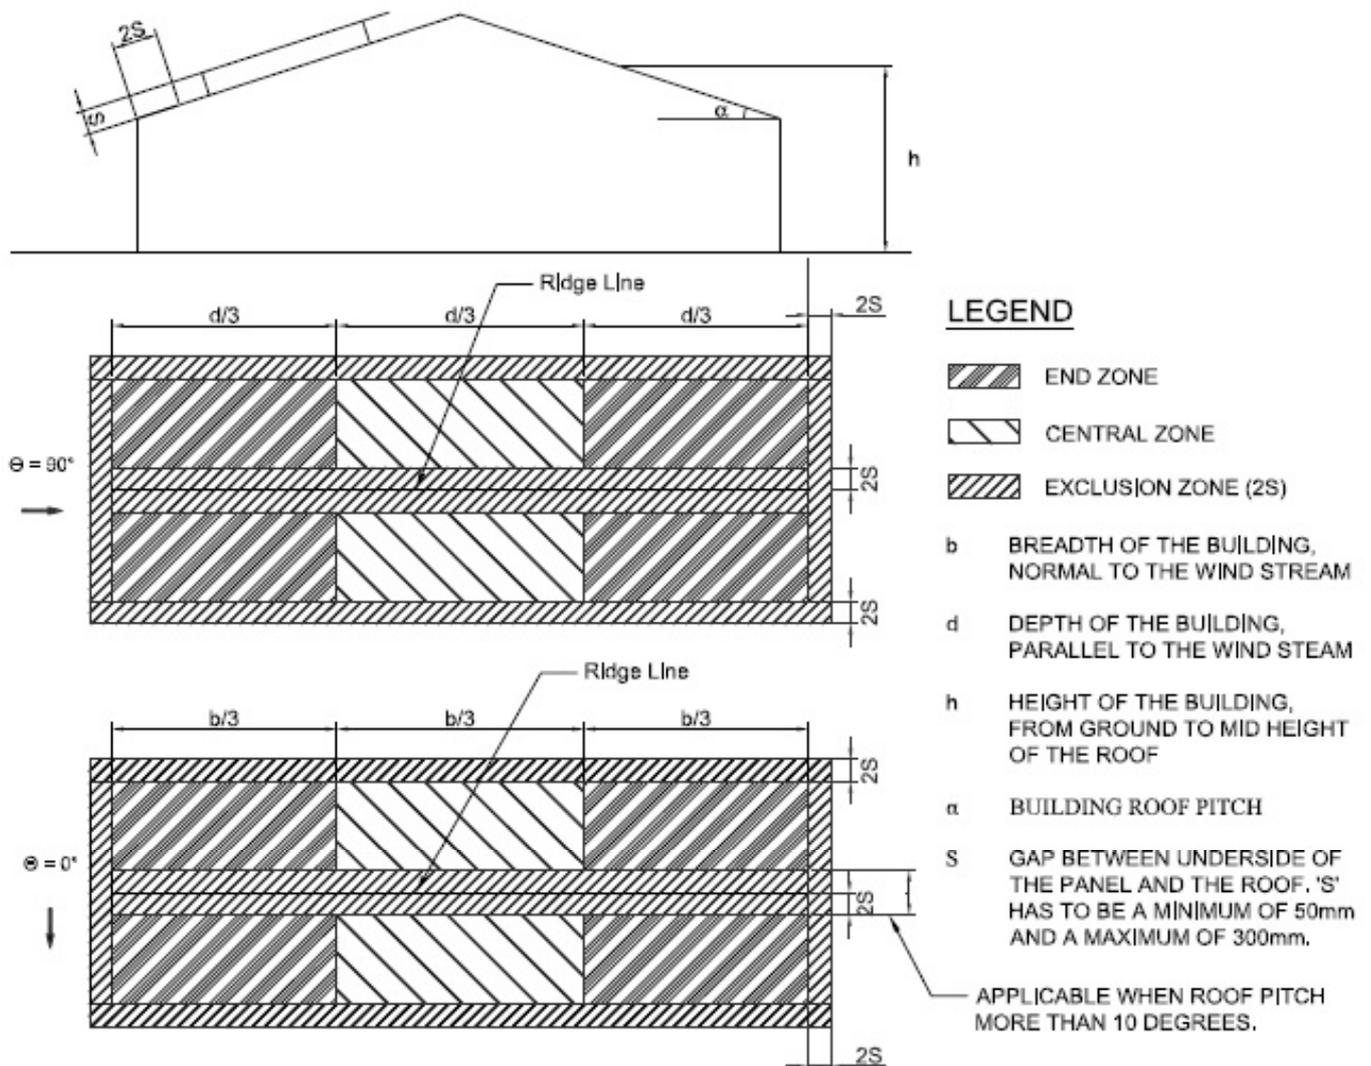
Roof Installation Area ($h/d \leq 0.5$ and $h/b \leq 0.5$)
